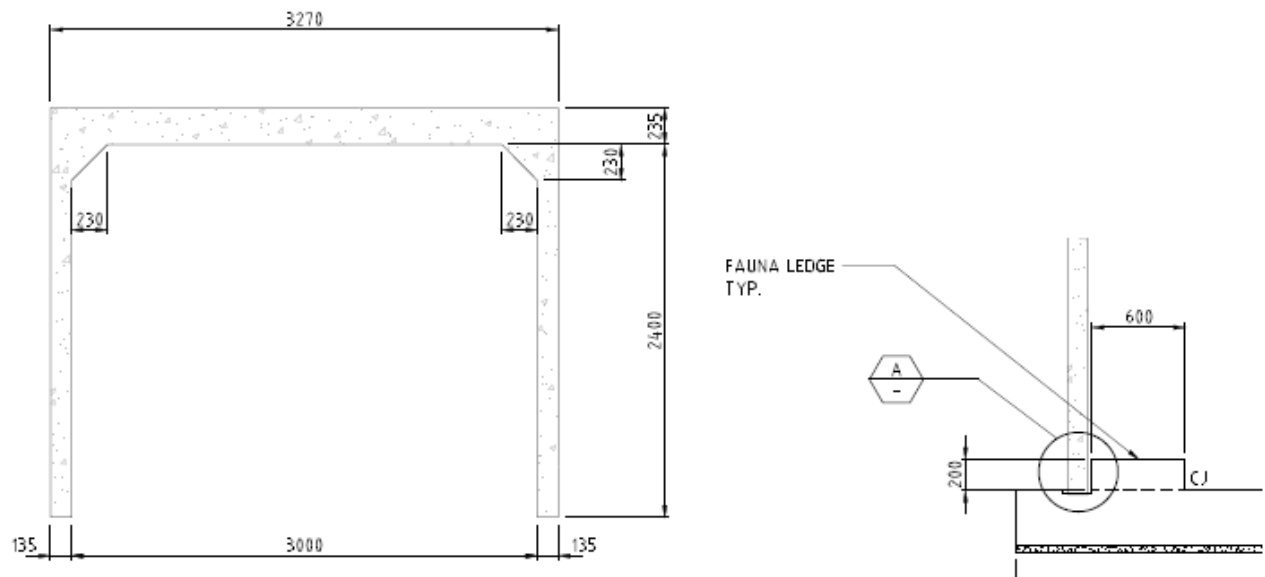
Cross section of the proposed culvert at Badgery's Creek
